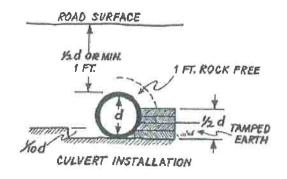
The elements of a properly installed ditch relief culvert. The culvert is angled at about 30 degrees to the road alignment to help capture flow and prevent culvert plugging or erosion of the inlet area. It is set at the base of the fill (ideally) or with a grade slightly steeper than the grade of the contributing ditch (but never with a grade less than 2 percent) (USDA-SCS, 1983). At a minimum, the grade of the ditch relief culvert should be sufficient to prevent sediment accumulation at the inlet or deposition within the culvert itself (it should be self-cleaning) (USDA-SCS, 1983).
